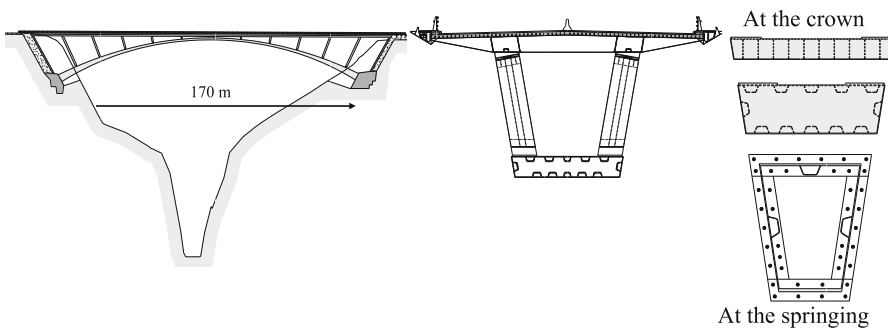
Bridge on Ravine Fontaine – Elevation and cross sections
